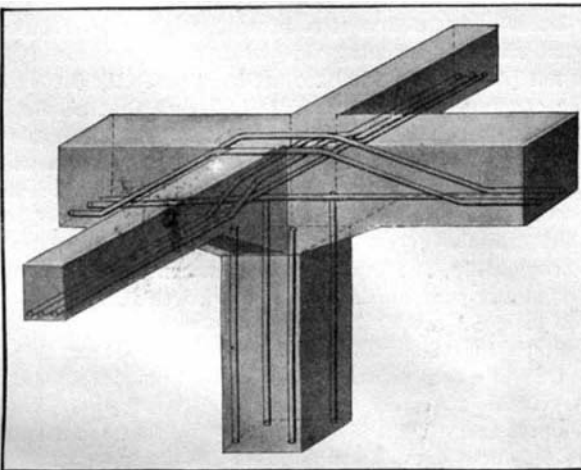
A Reinforced Concrete Pier for Railway Traffic.
